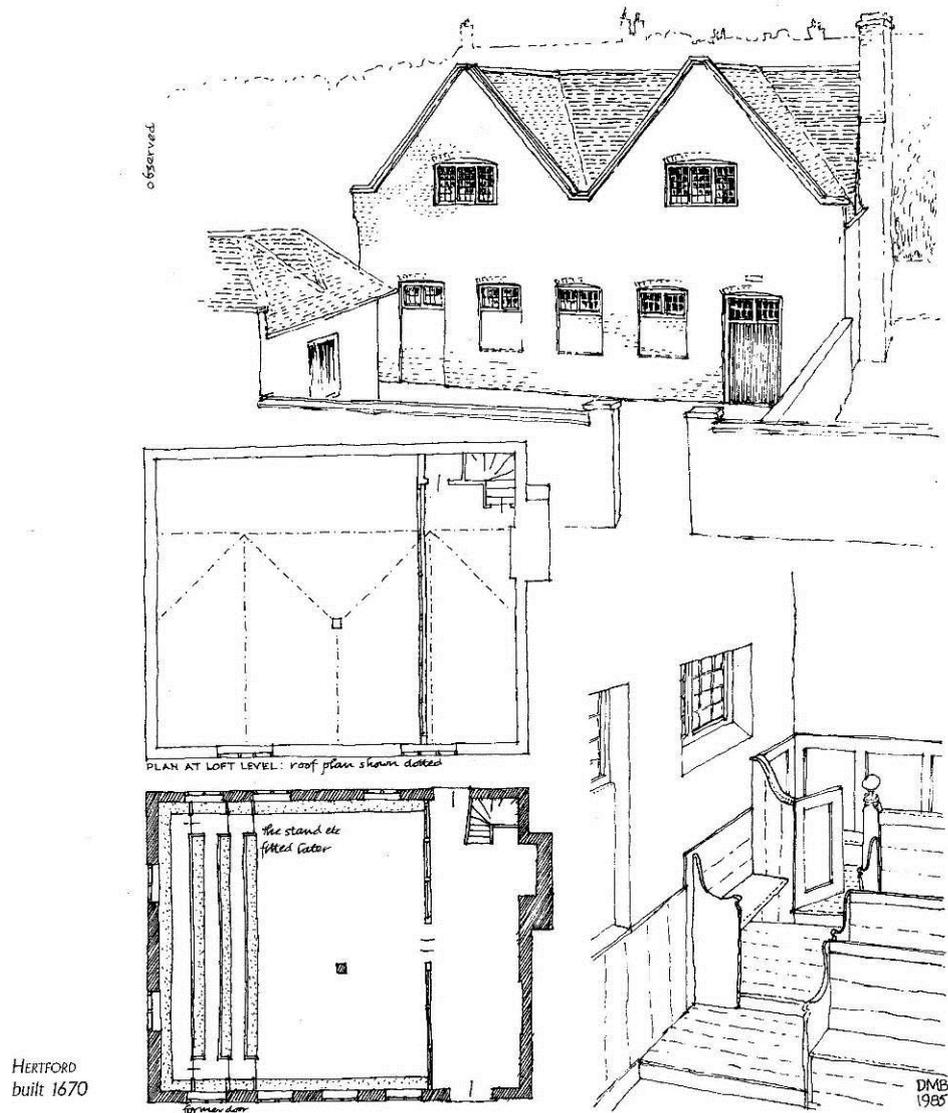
Plan, elevation and detail of elders' stand, from Butler, Vol. 1, p. 256 (north is at the bottom of the plan)
